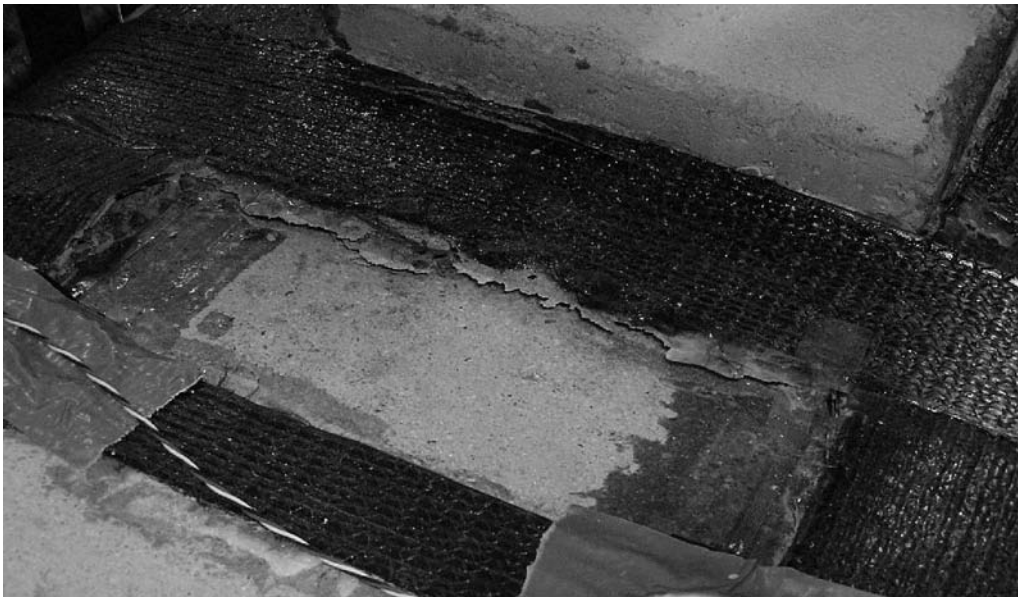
Spalled concrete underneath transverse Fibrwrap hoop (AR specimen)
